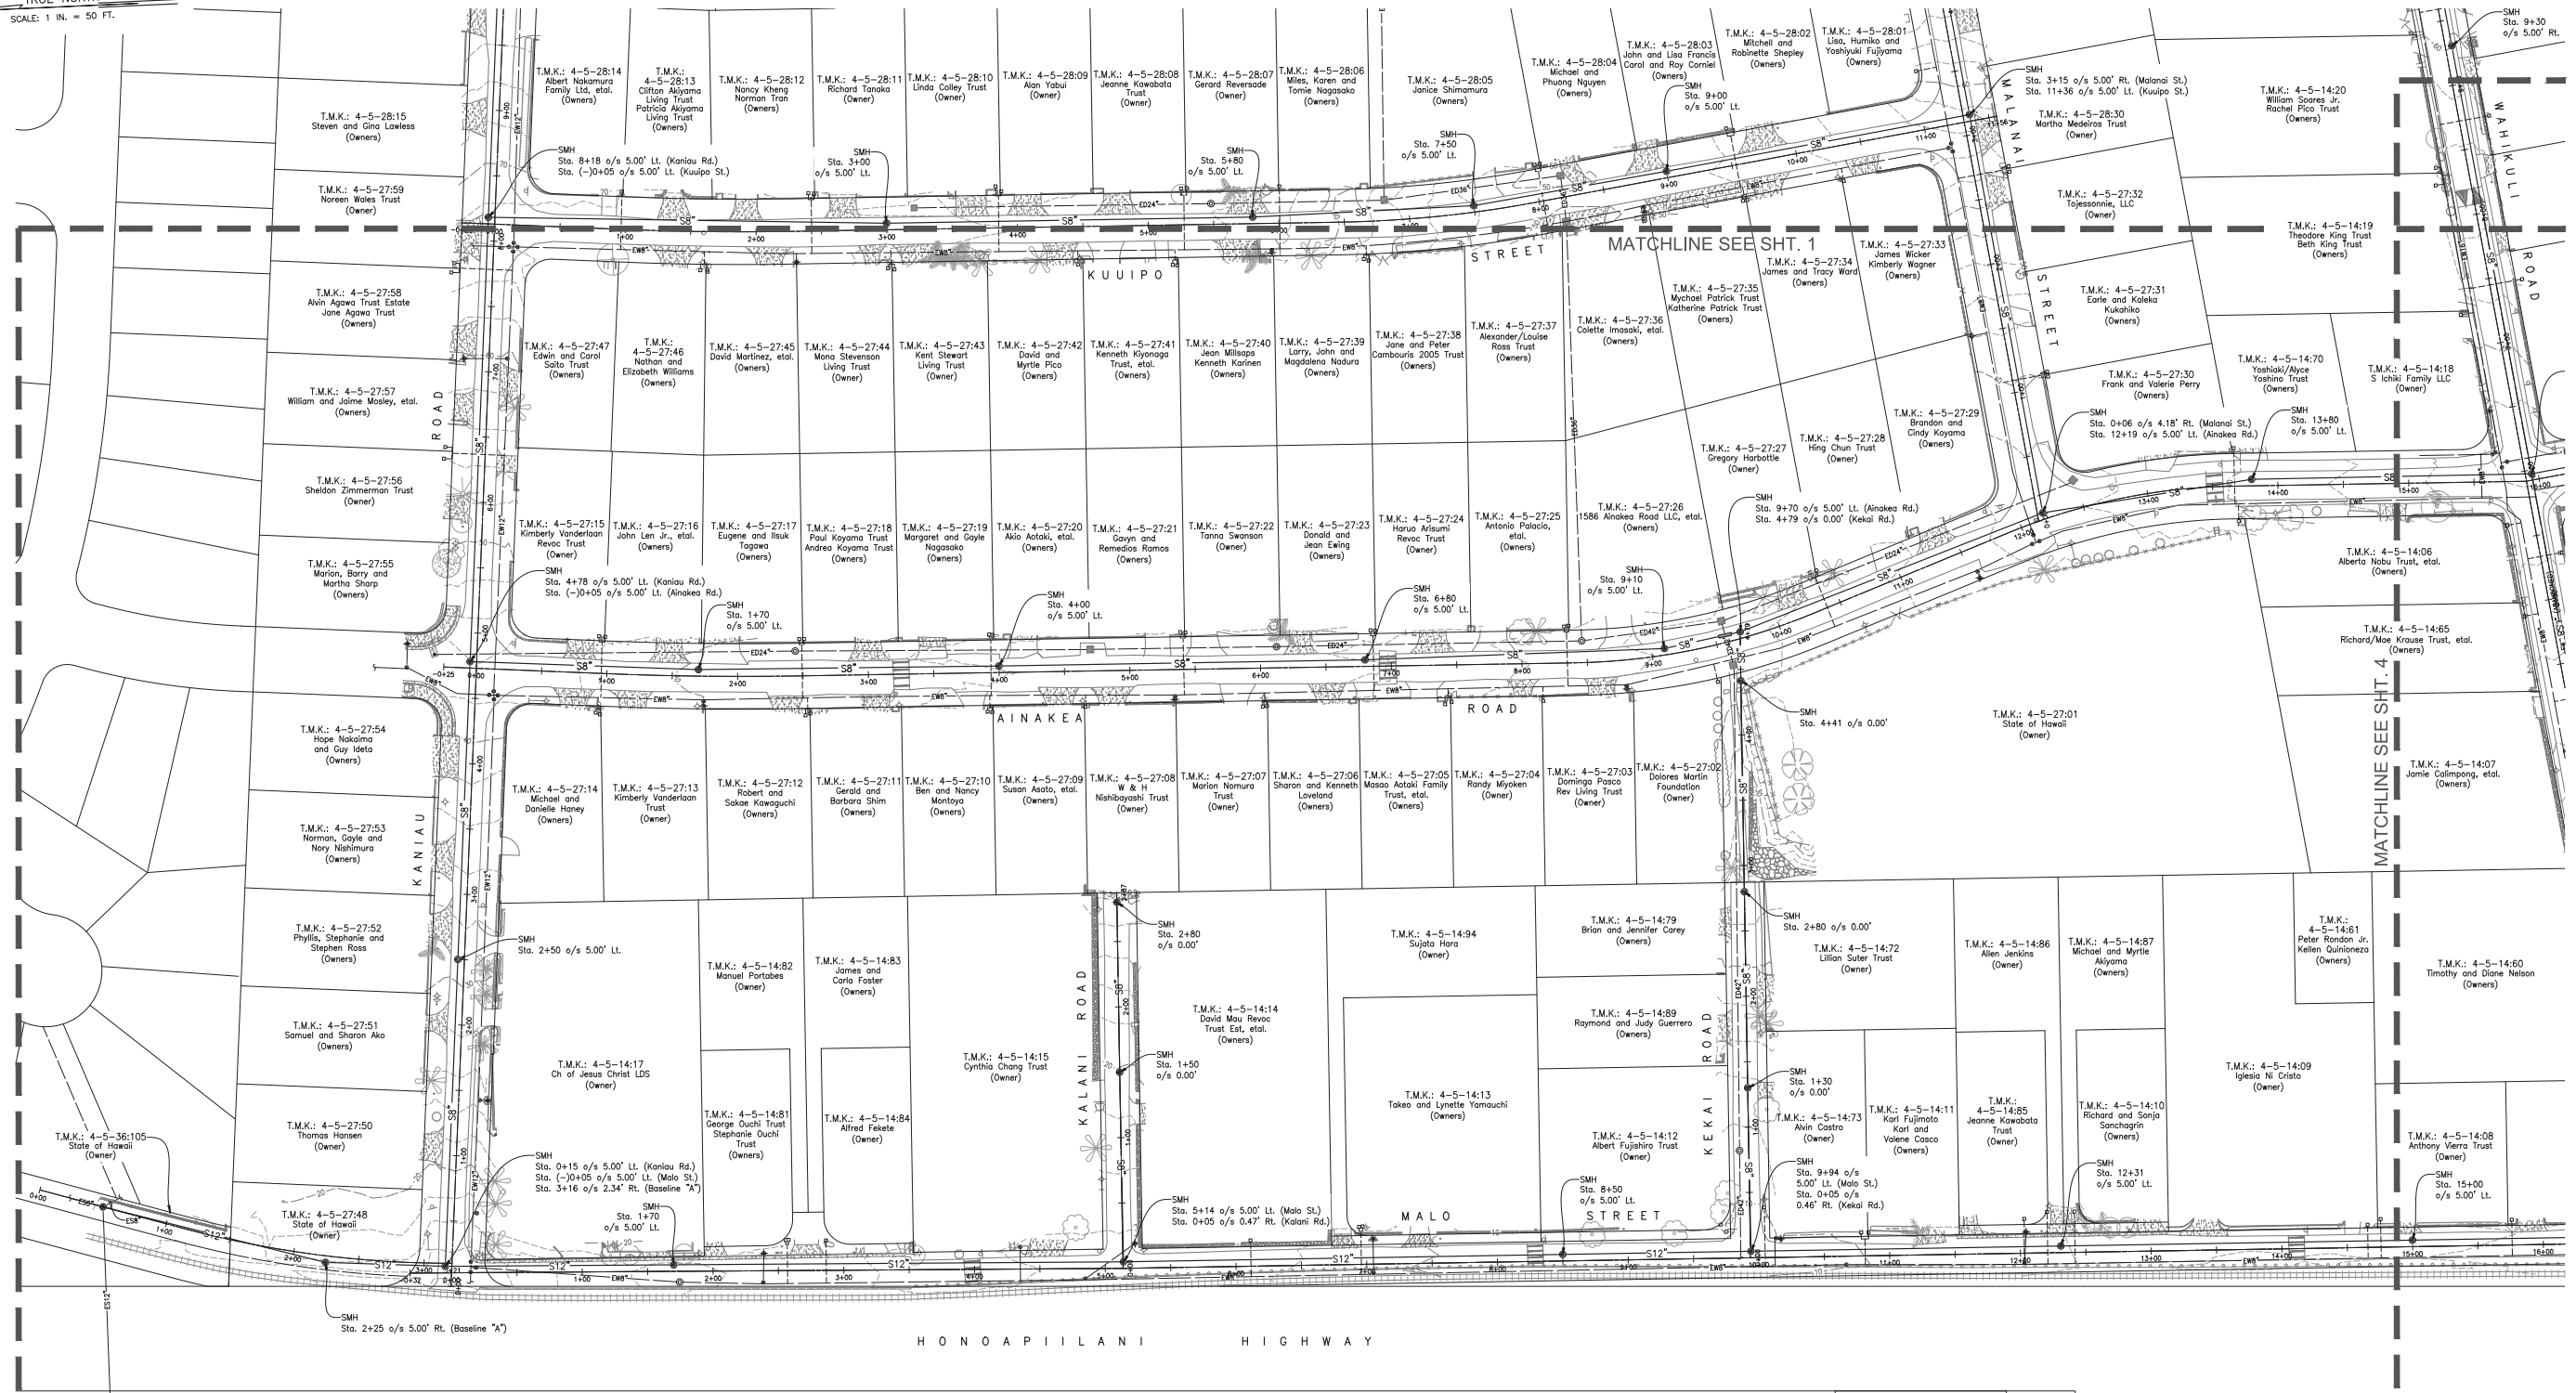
EXHIBIT C - OVERALL SITE PLAN (2 OF 4)
